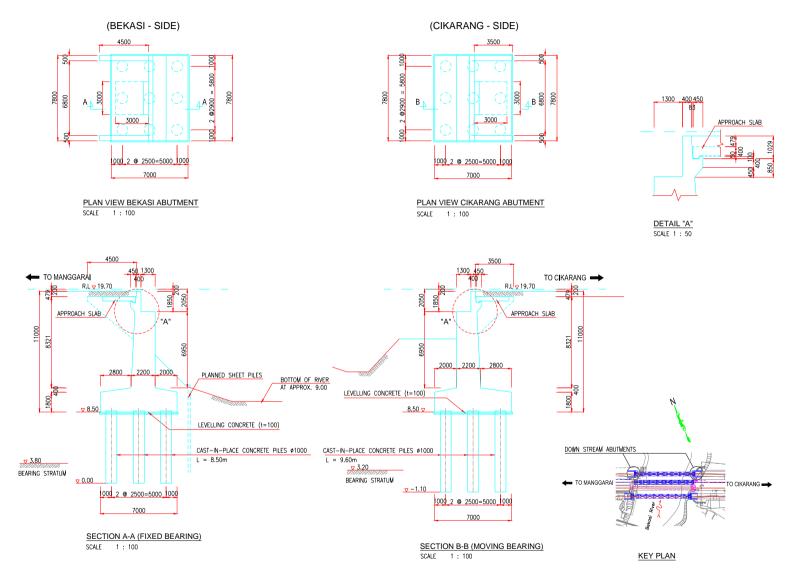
Bekasi Bridge – Downstream Abutments
